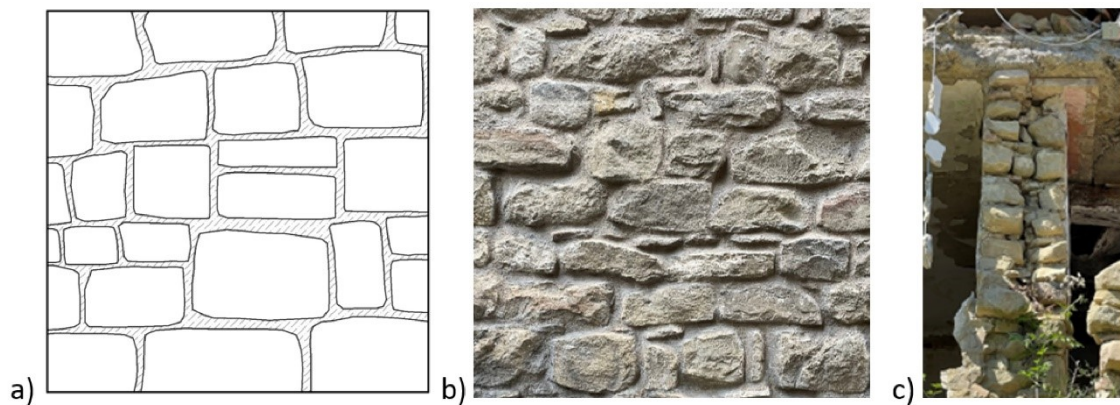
Barely cut stone masonry (M2) – a) Graphic reconstruction of the wall texture type (1mx1m); b) Wall façade example, photo taken in Castelsantangelo sul Nera (MC); c) Wall section example, photo taken in San Ginesio (MC).
